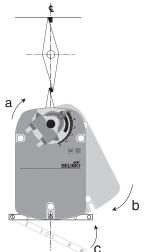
Standard mounting of optional motorized exhaust actuator
